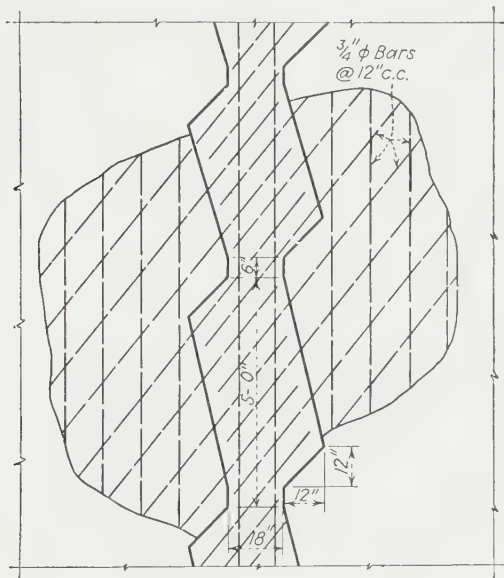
Bartlett Dam, detail of vertical contraction joints.
